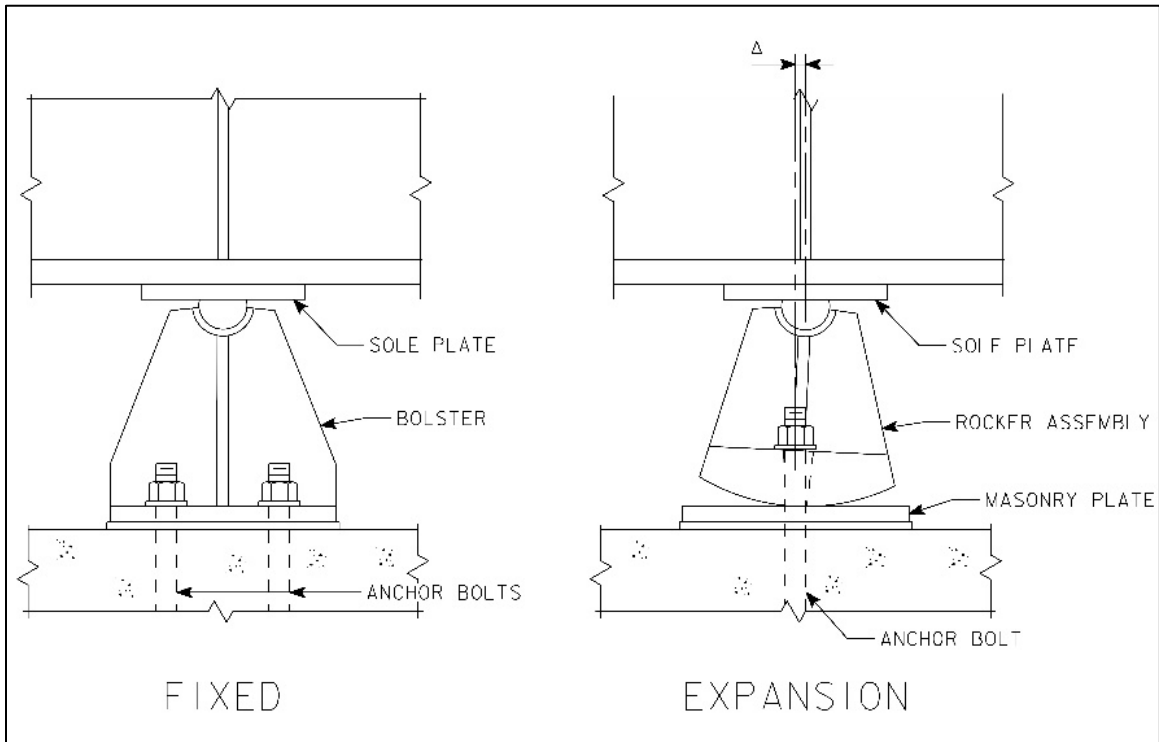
Steel Fixed Bolster and Steel Rocker Bearings
